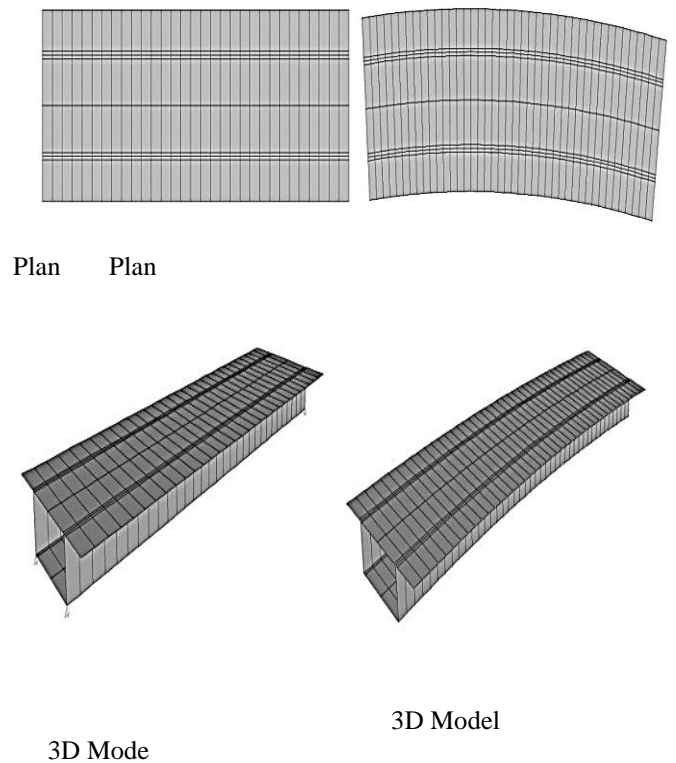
(a): Discretized model of simply supported Straight Box Girder Bridge in SAP 2000
